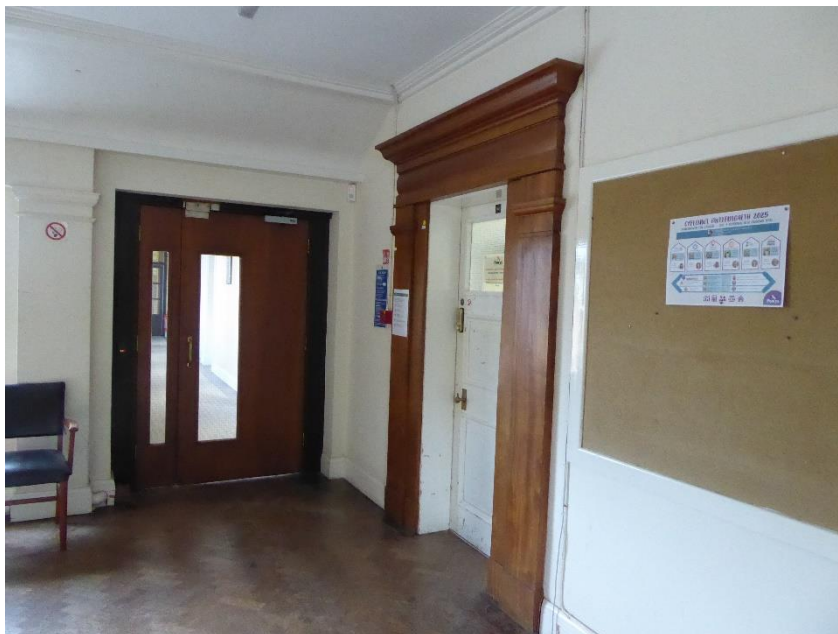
Example of Tuscan doorcase on 1st floor landing of 1959 staircase
